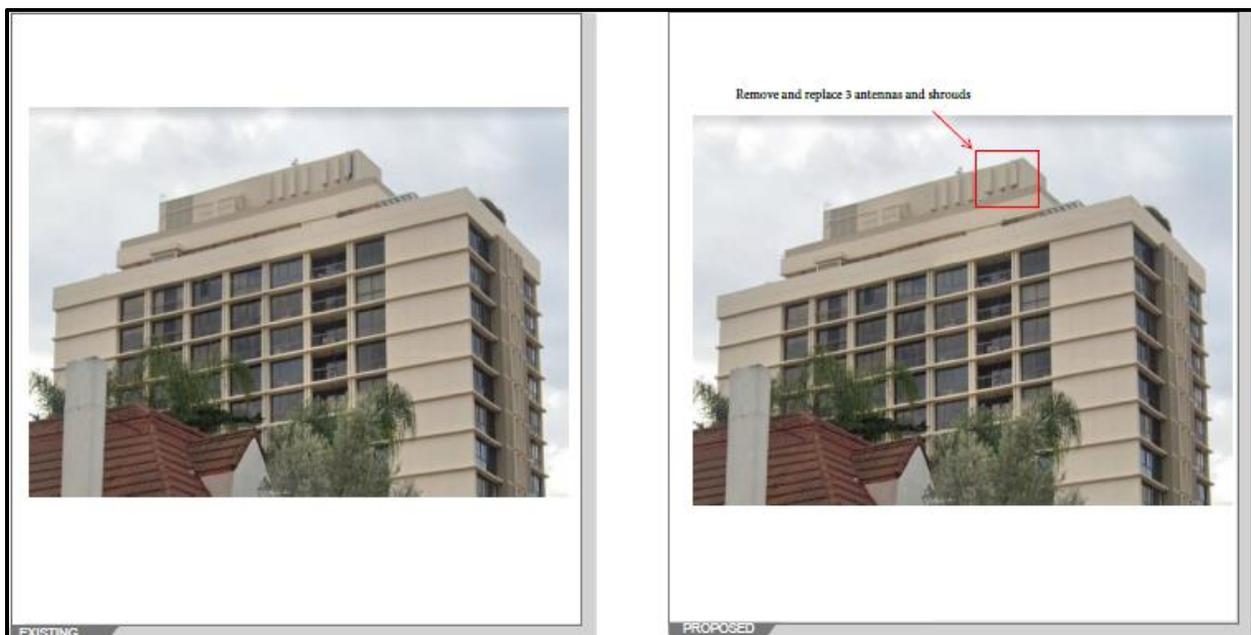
Photo-simulation of proposed antennas with shrouds on the north face of roof penthouse
